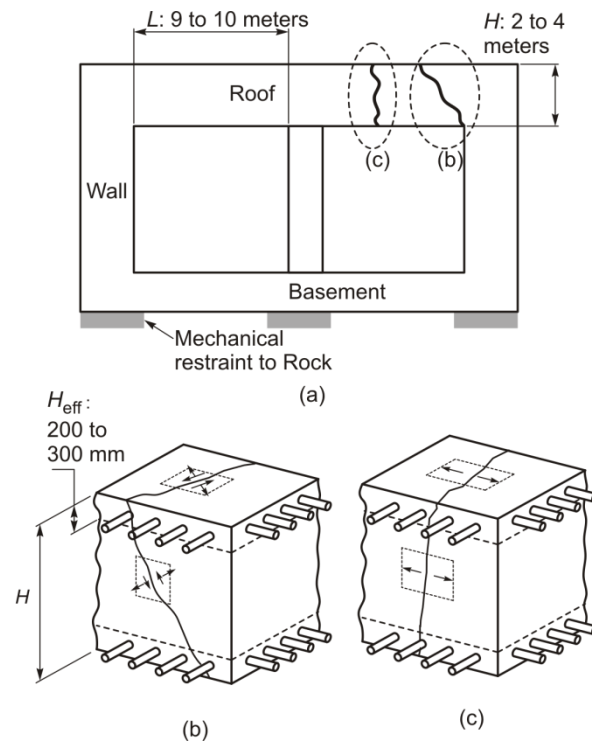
Identification of needed benchmarks for large concrete structure applications
